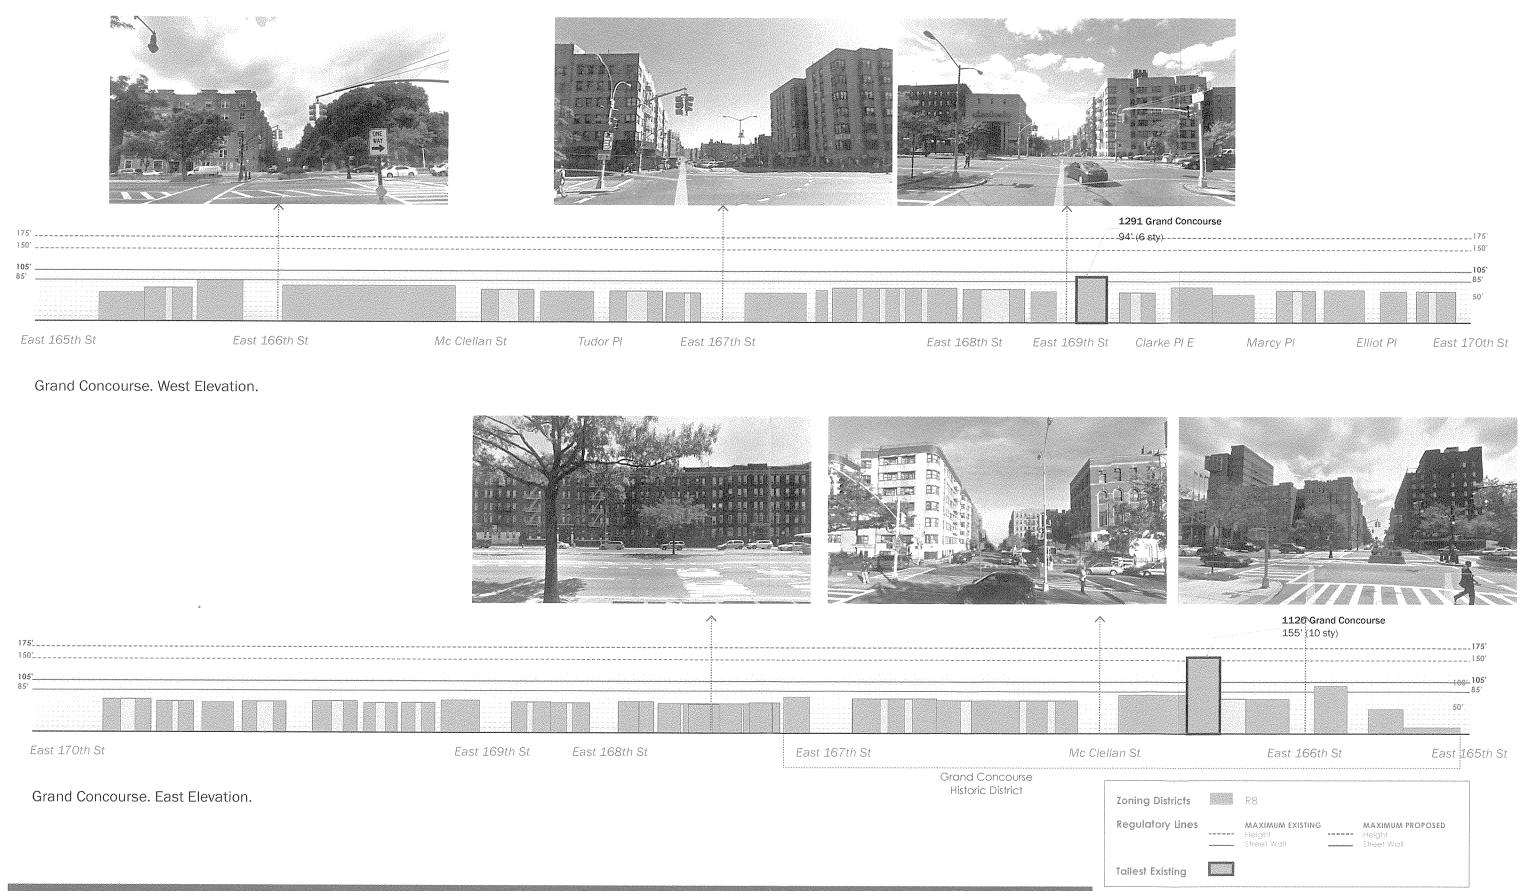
GRAND CONCOURSE WEST AND EAST ELEVATIONS
